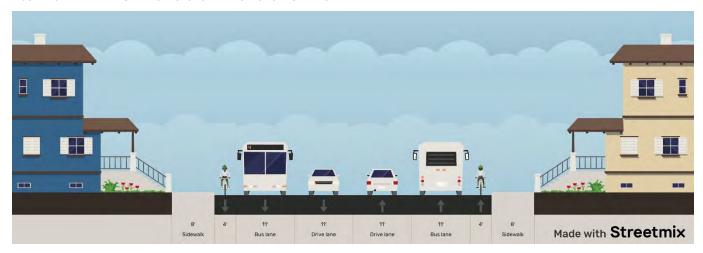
BLAKE AVENUE TYPICAL SECTION 3: 19TH STREET TO HYLAND PARK DRIVE
